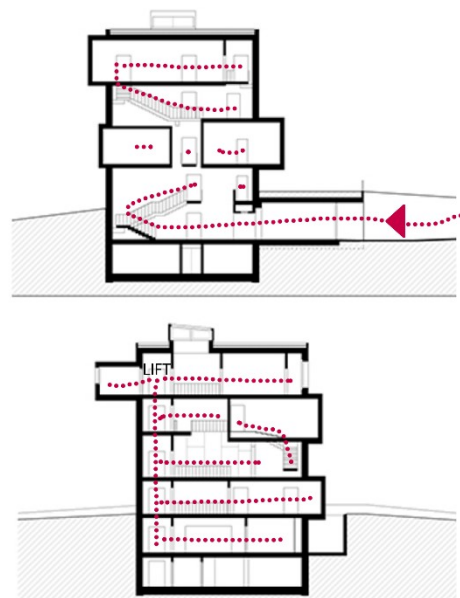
Kemes Volcano Park, Hungary: Sections. (Source: Floor plans by Foldes Architects with markings by Filová, 2021)
